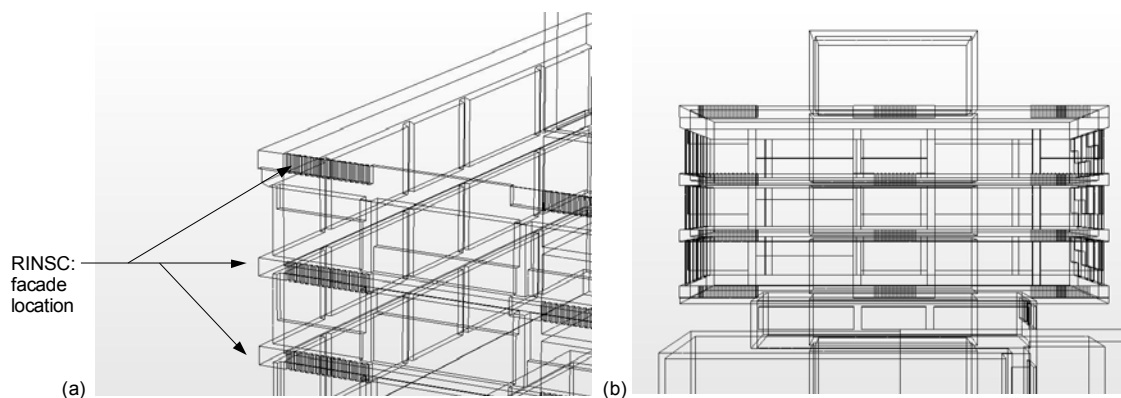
CAD drawings demonstrating façade location of RINSC systems on a building envelope.
